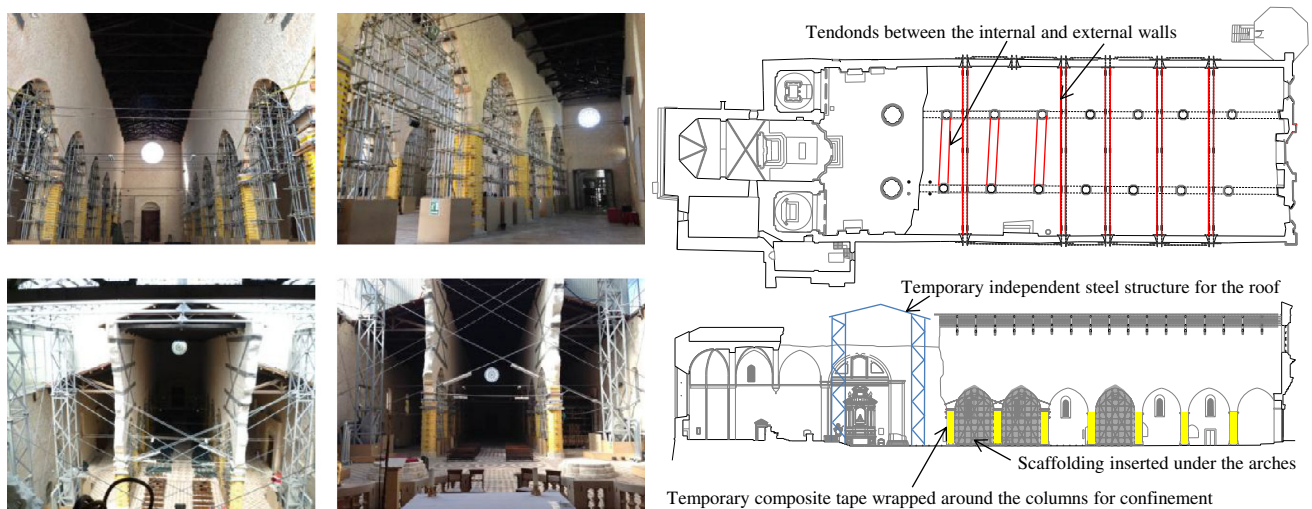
Scaffolding system and other reinforcements. *Highlighted* in the lateral sections are independent steel structures required to implement a temporary roof
